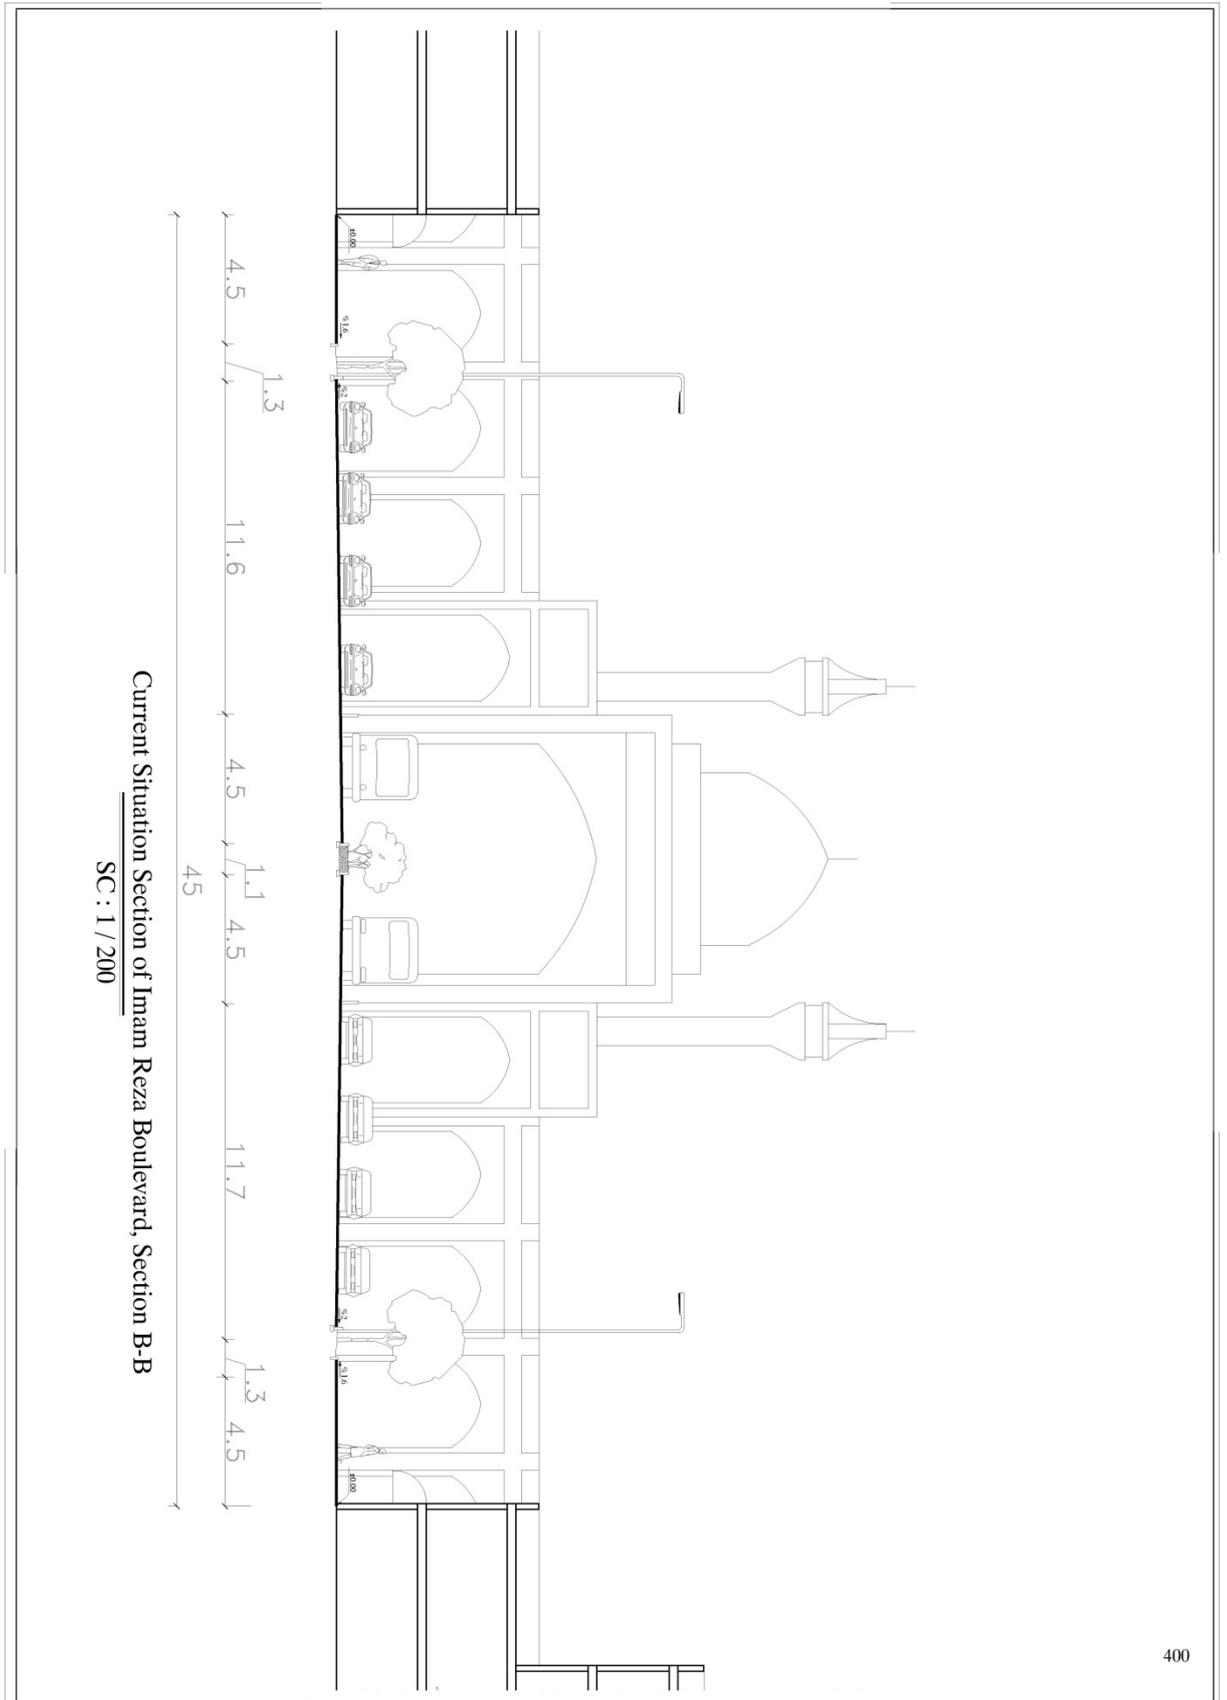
Section of Imam Reza Street, Section B-B. (Author)
